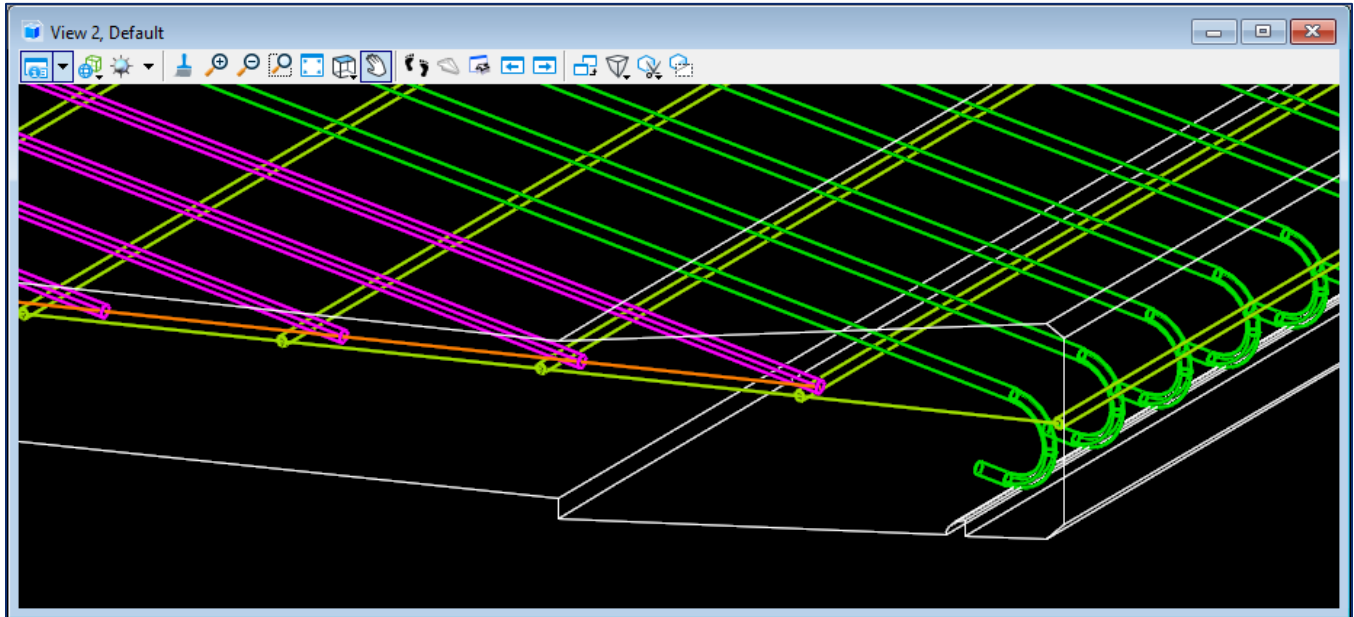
Corner of Deck Showing Modeled Top Rebar
